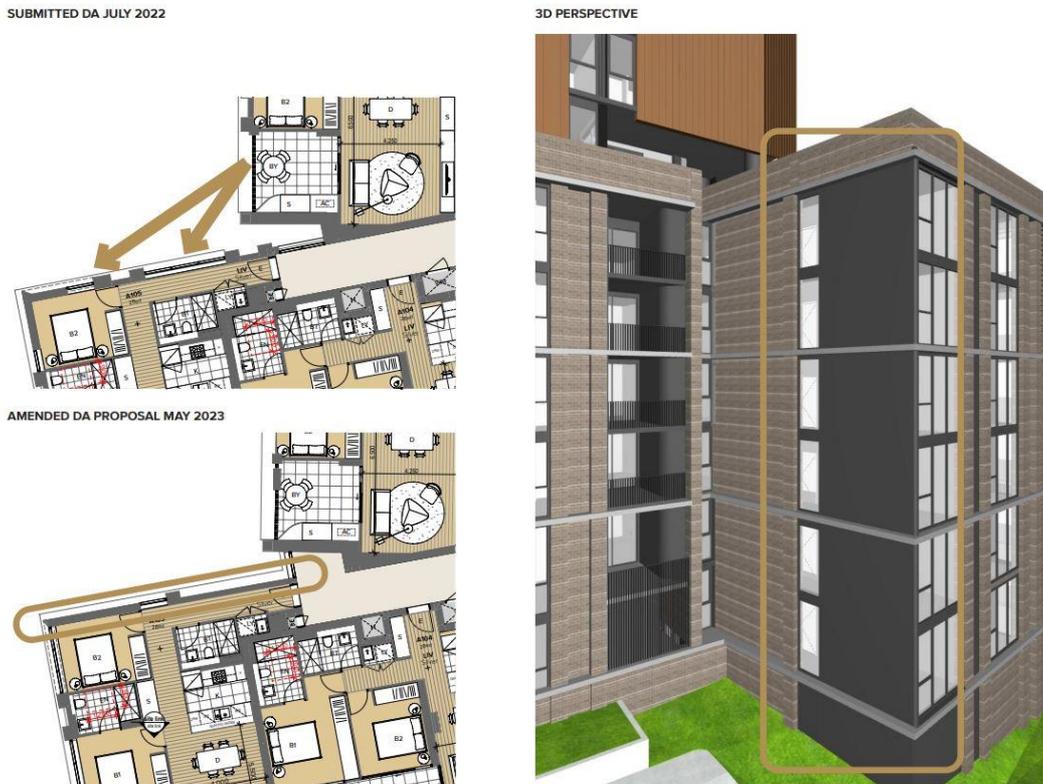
| Proposed privacy treatment between apartments in Building C (Source: Applicant's RTS)
